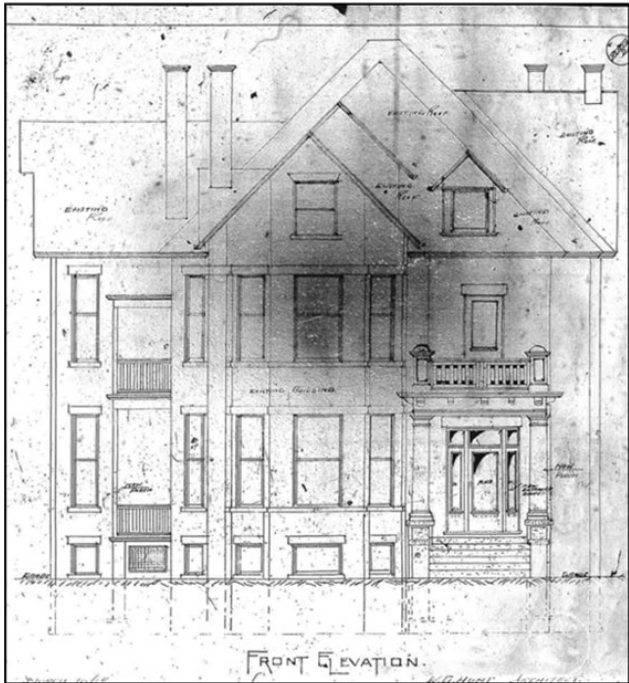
510 Jarvis Street, front elevation, 1919 (Building Records).
